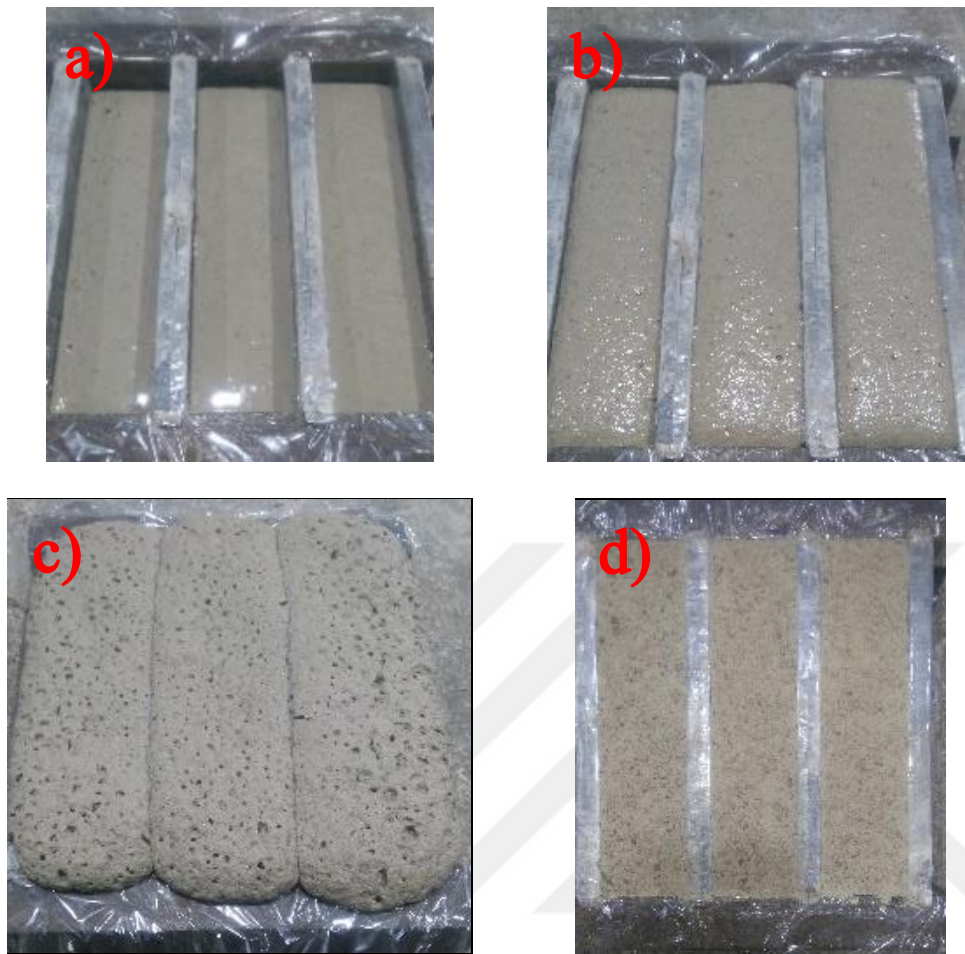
Preparation of 40-0-75: a) Immediately after casting, b) 8 minutes after casting, c) 15 minutes after casting, and d) Surface cut ~2h after casting.
